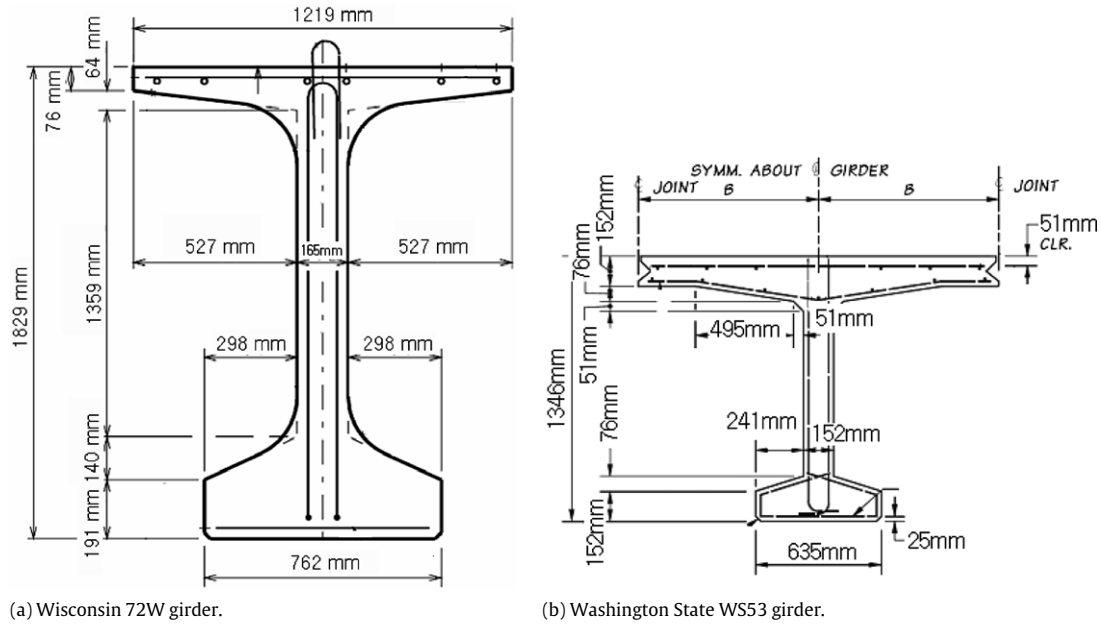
Wisconsin 72W girder and Washington State WS53 girder dimensions.
